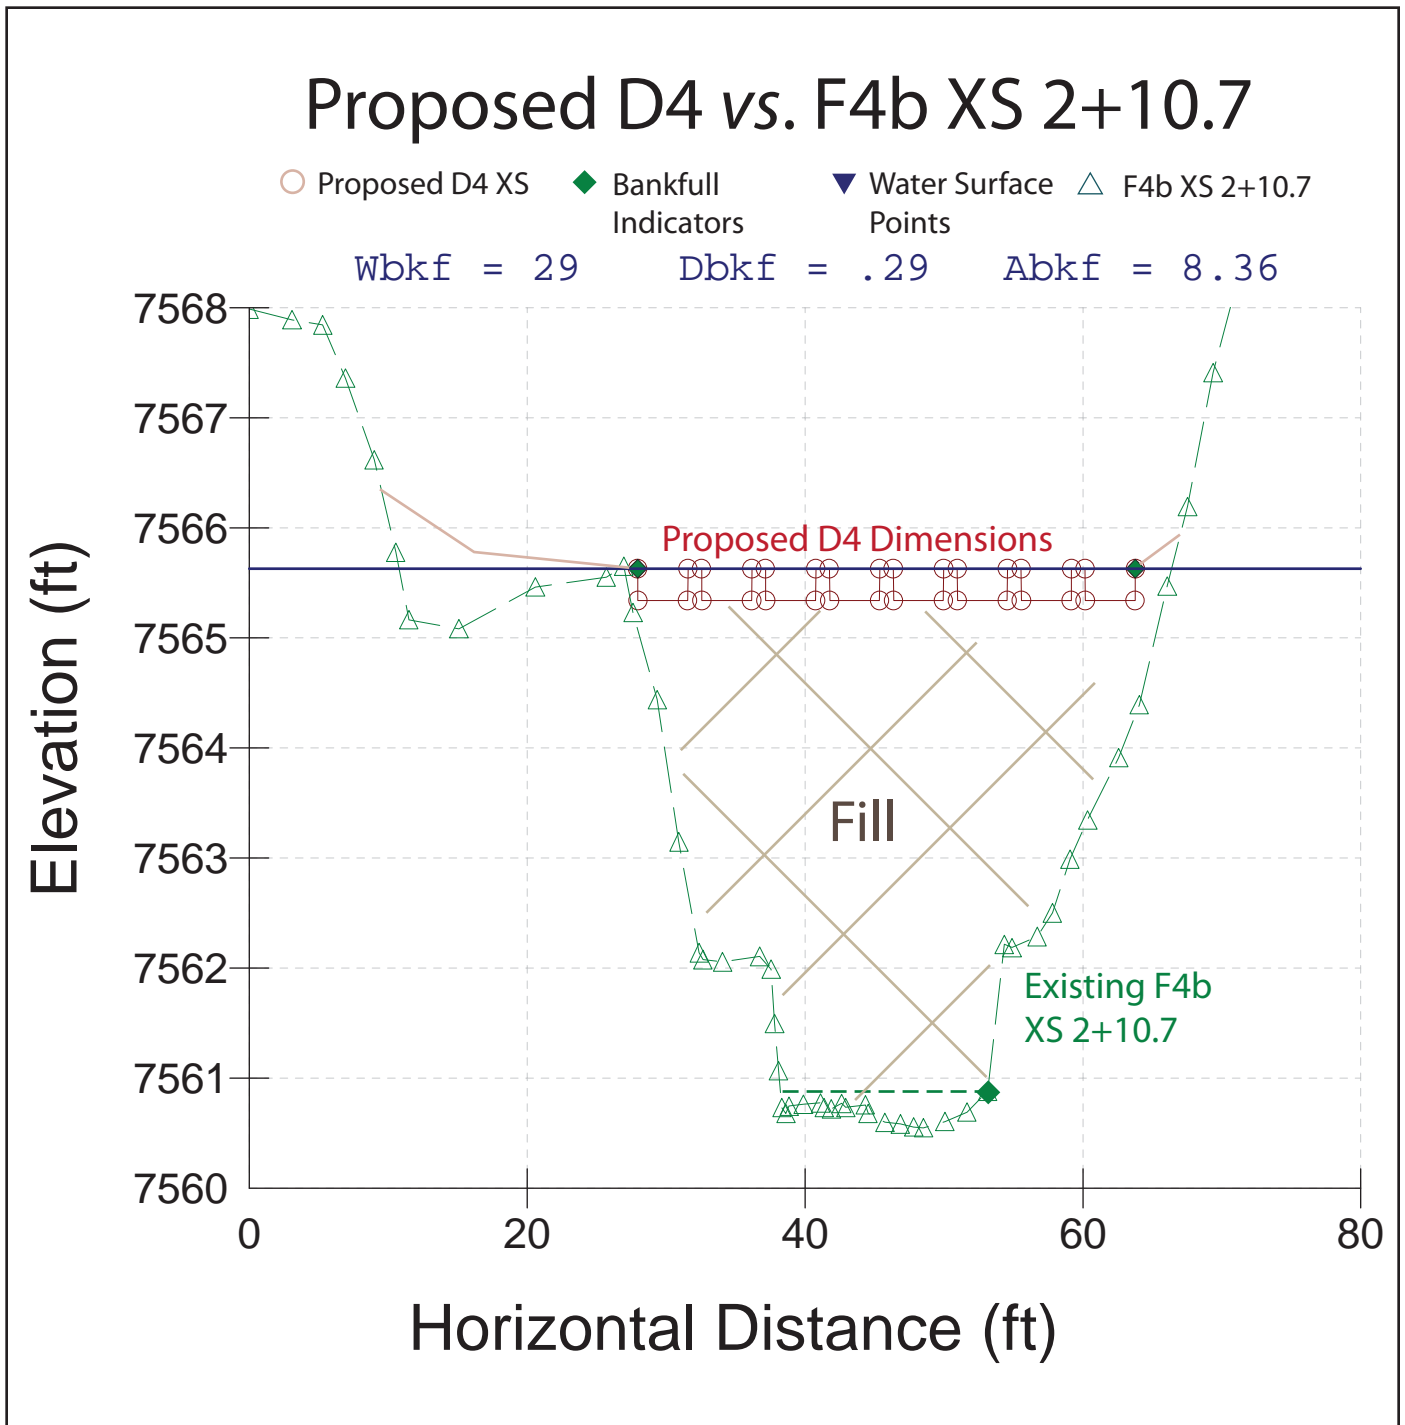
The typical, proposed D4 cross-section dimensions compared to the existing F4b cross-section 2+10.7, indicating the extensive fill requirements and new bankfull elevation.
